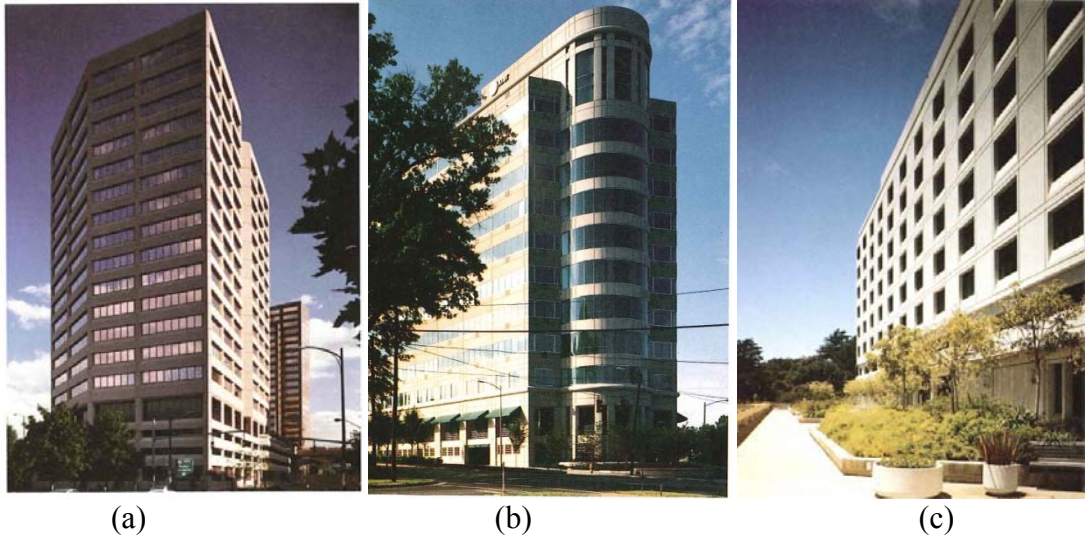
Panel configurations: (a) spandrel beams and column covers, (b) spandrel panels and glazing, (c) punched window design (PCI, 1989)
